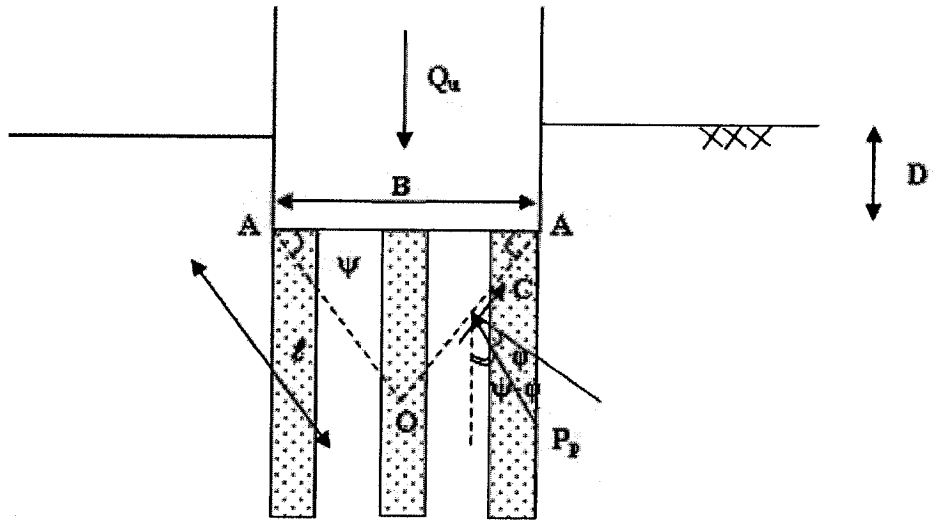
Failure of reinforced ground with stone columns under rigid foundation.
